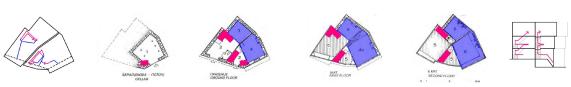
Combination of repetitive and different position of stairs - floor plans used from Grabrijan (1986)
